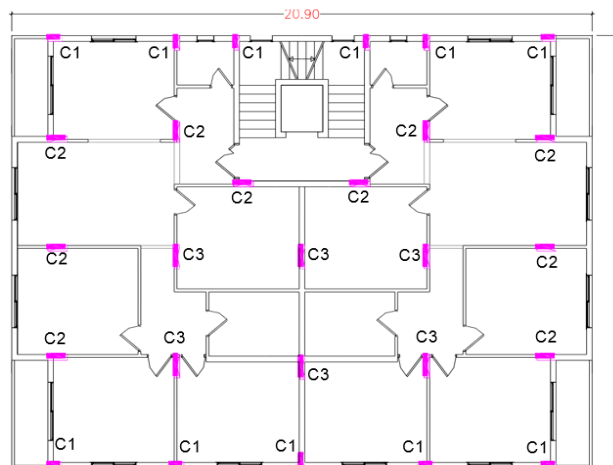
Floor plan and columns location for earthquake resistant building-2
